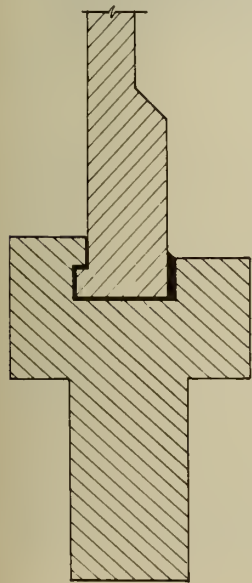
Section Showing the Detail of the Expansion Joint between the Dome Shells and the Supporting Beams
